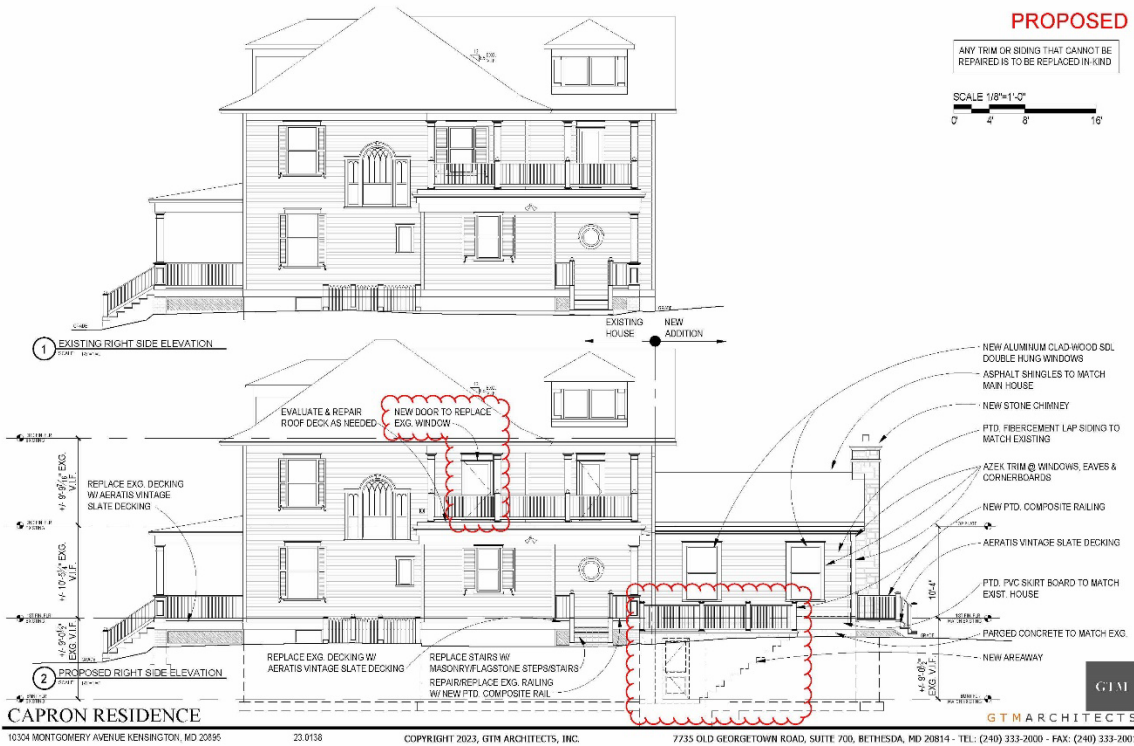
The revised right-side elevation shows the existing, top, and proposed areaway and window converted into a door on the second floor clouded in red.
